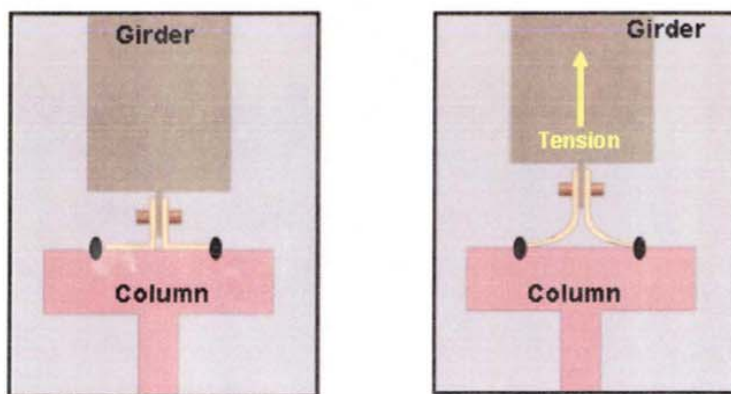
Plan View of Knife Connection Deformation in Tension
